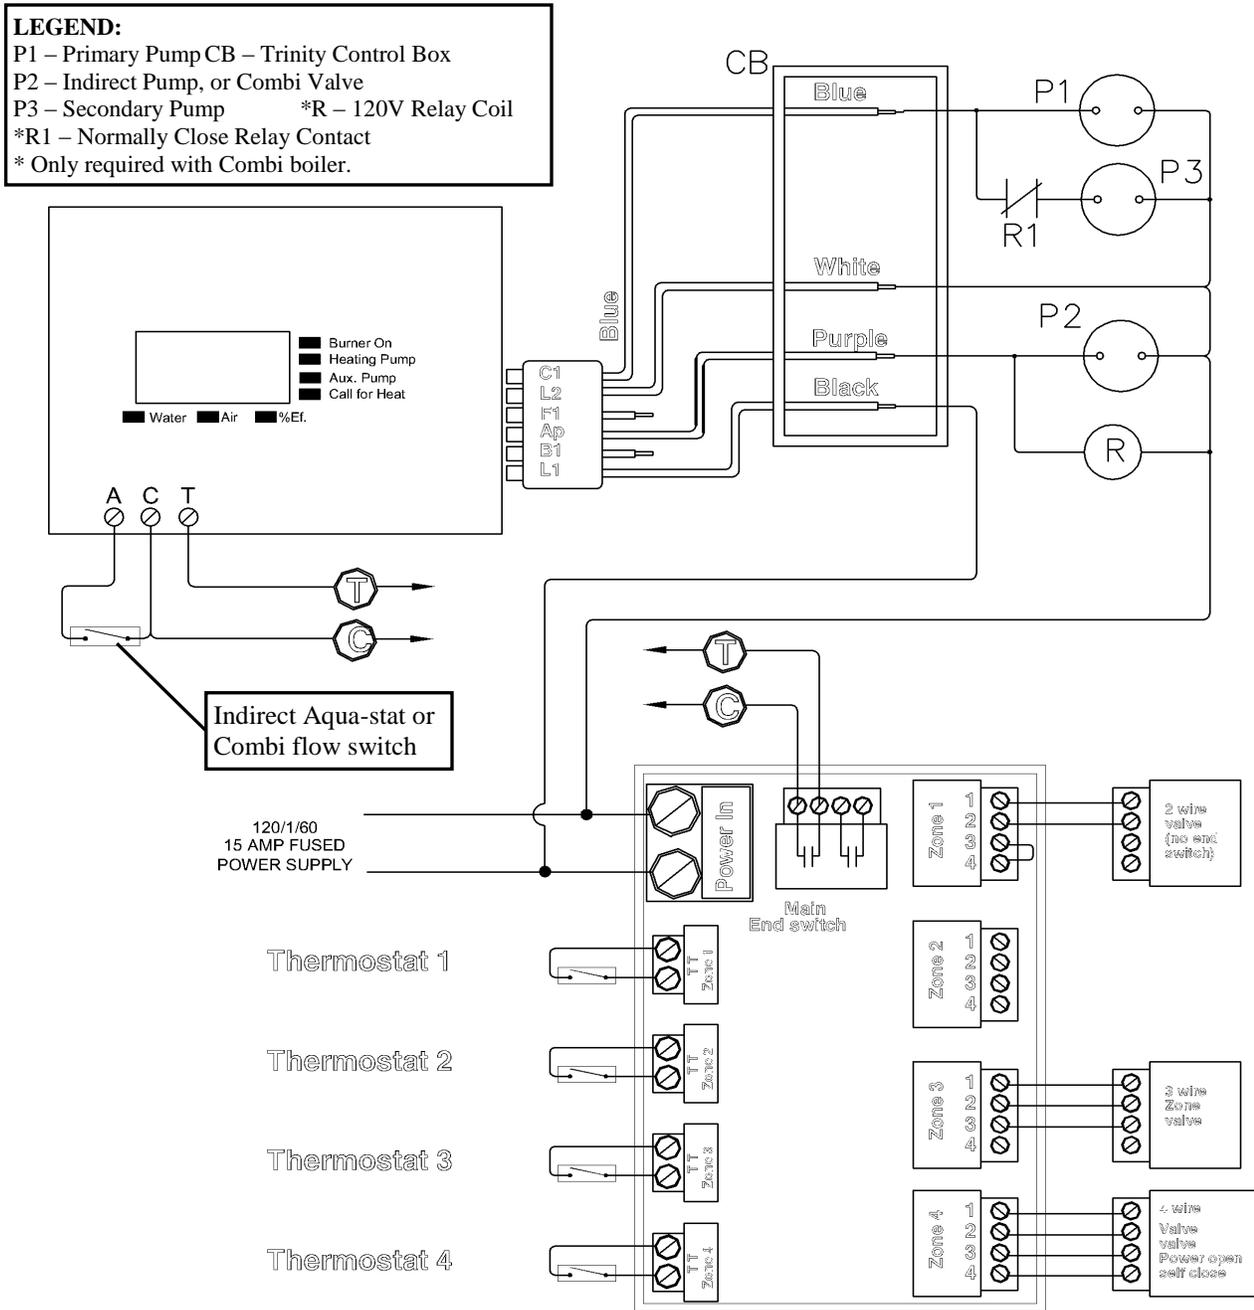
illustrates a typical wiring configuration required for a heating system using zone valves without a zone valve controller.
